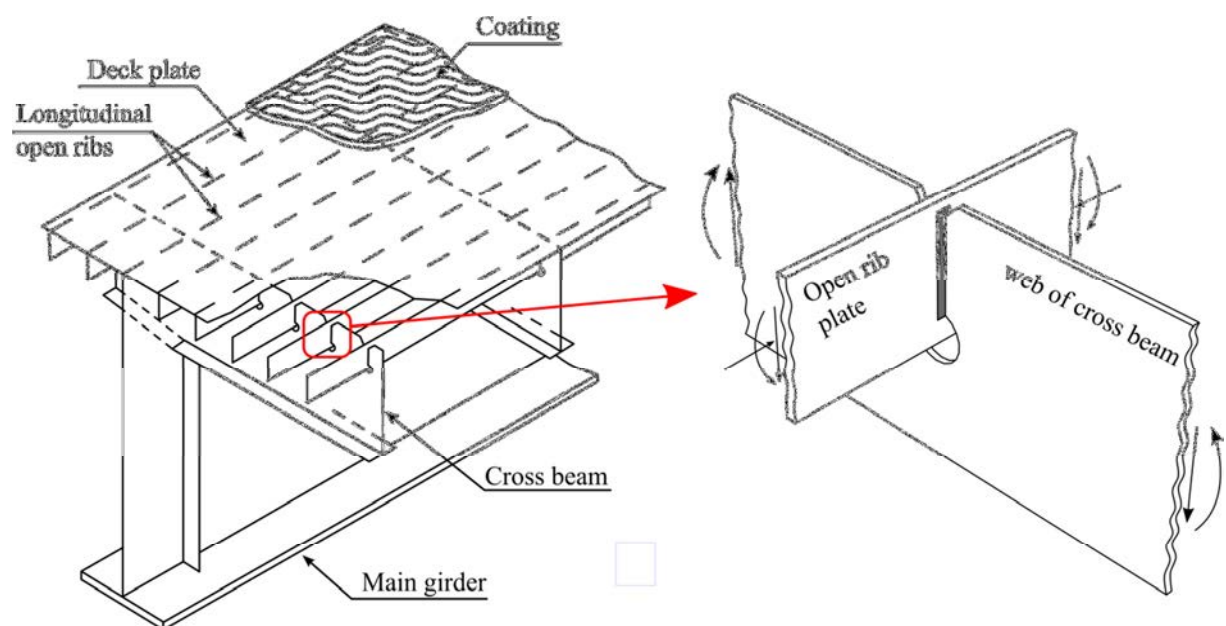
Orthotropic bridge deck and sectional forces in an orthotropic bridge deck with open rib
